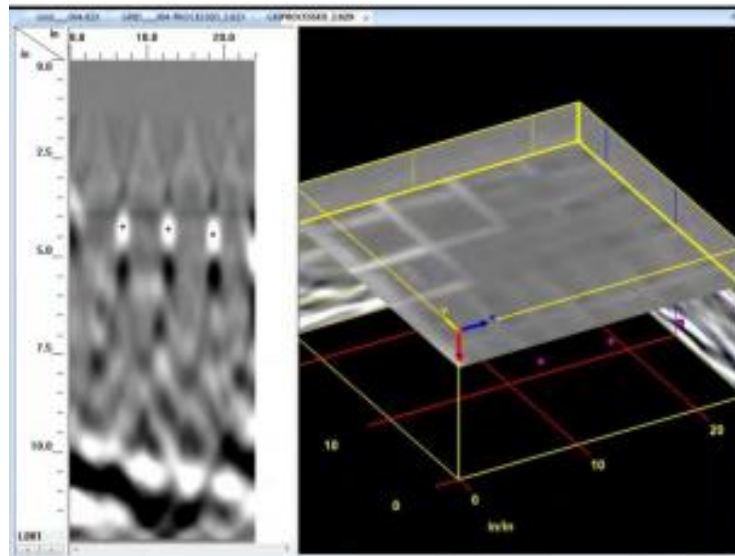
Radargram and depth slice of section of reinforced concrete [18]
